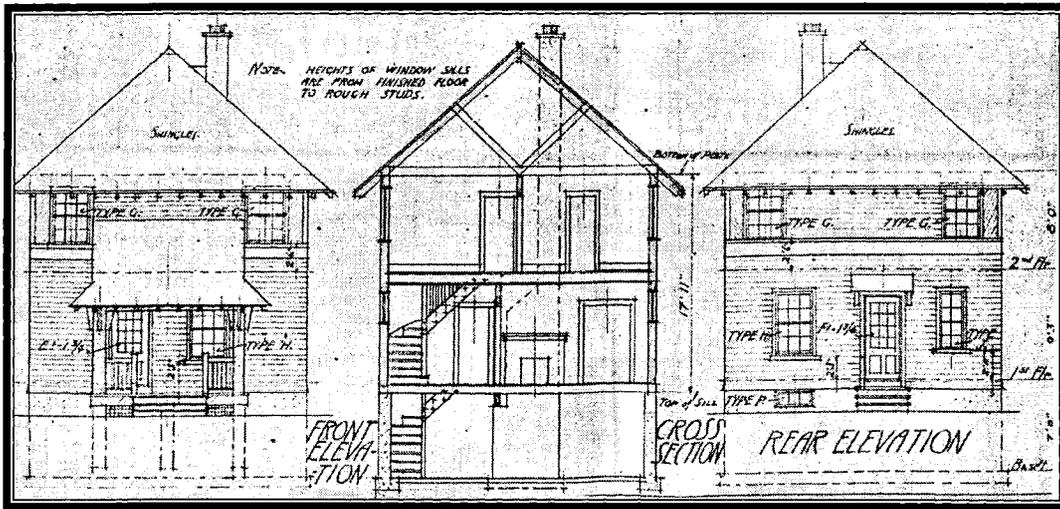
Wamboldt Home, Front Elevation, Cross-Section and Rear Elevation. Bessie's bedroom window was on the second story, left side of the Front Elevation.⁷¹
